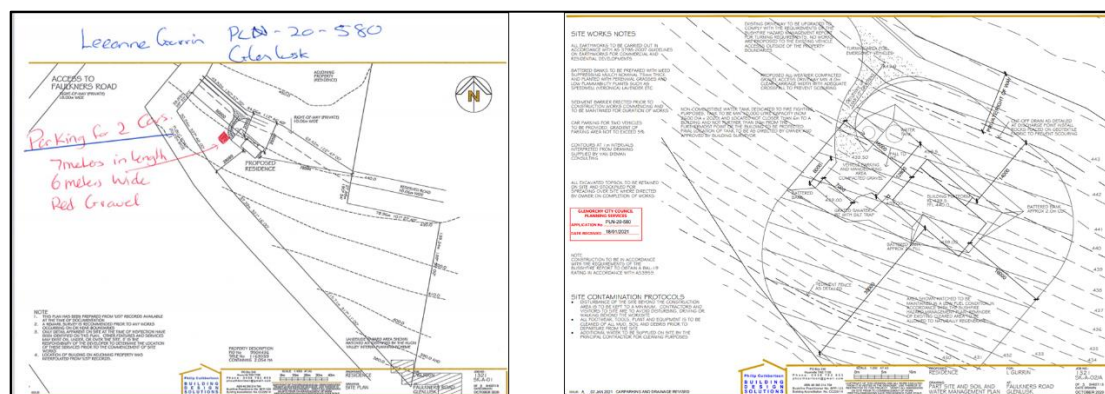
Snapshots of advertised (left) and revised (right) parking plan – PLN-20-580
